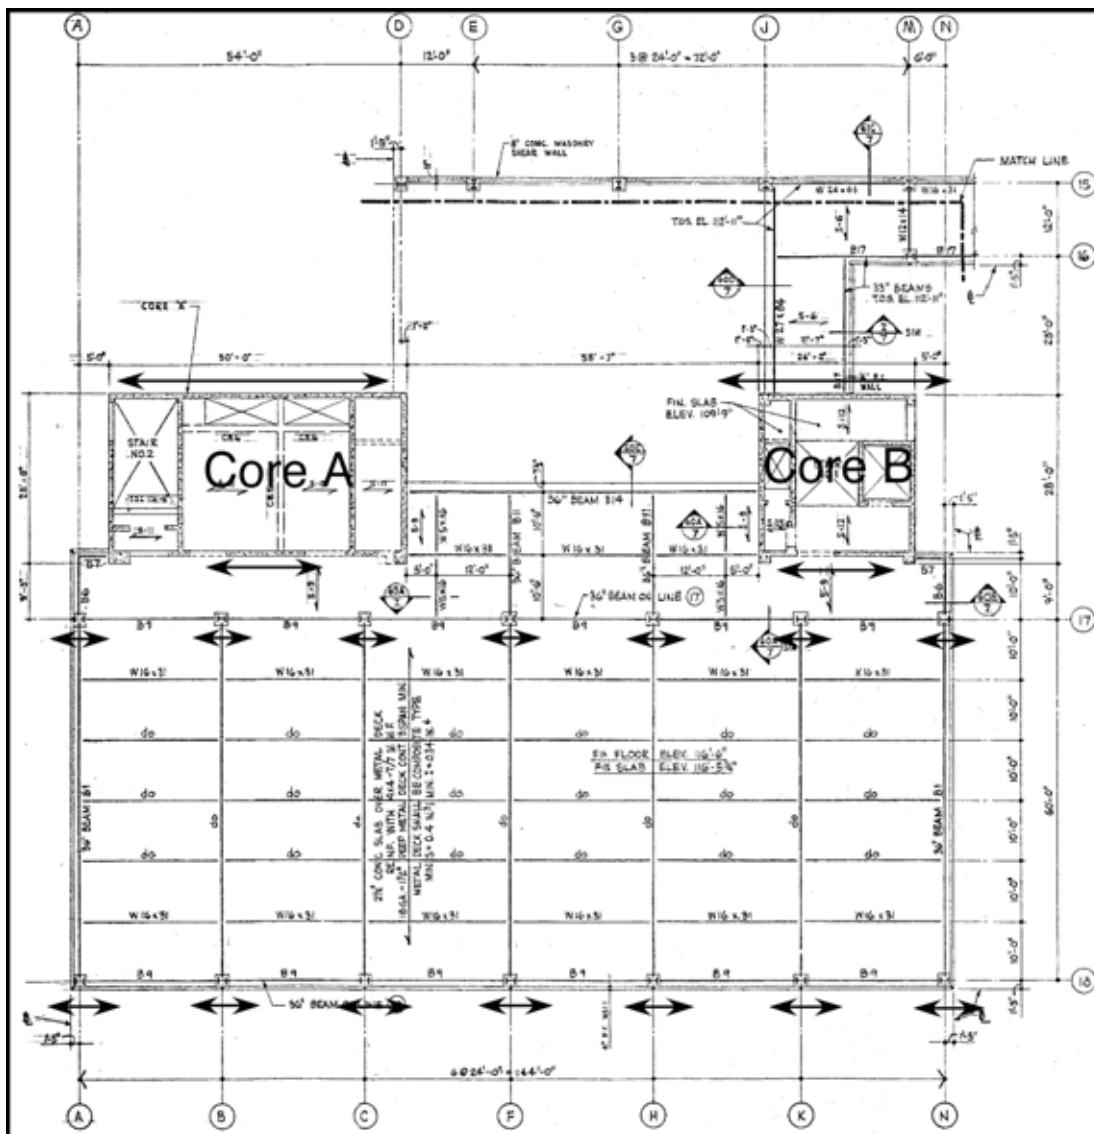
Seismic Load Path, East West Loading, Library (Plan)
